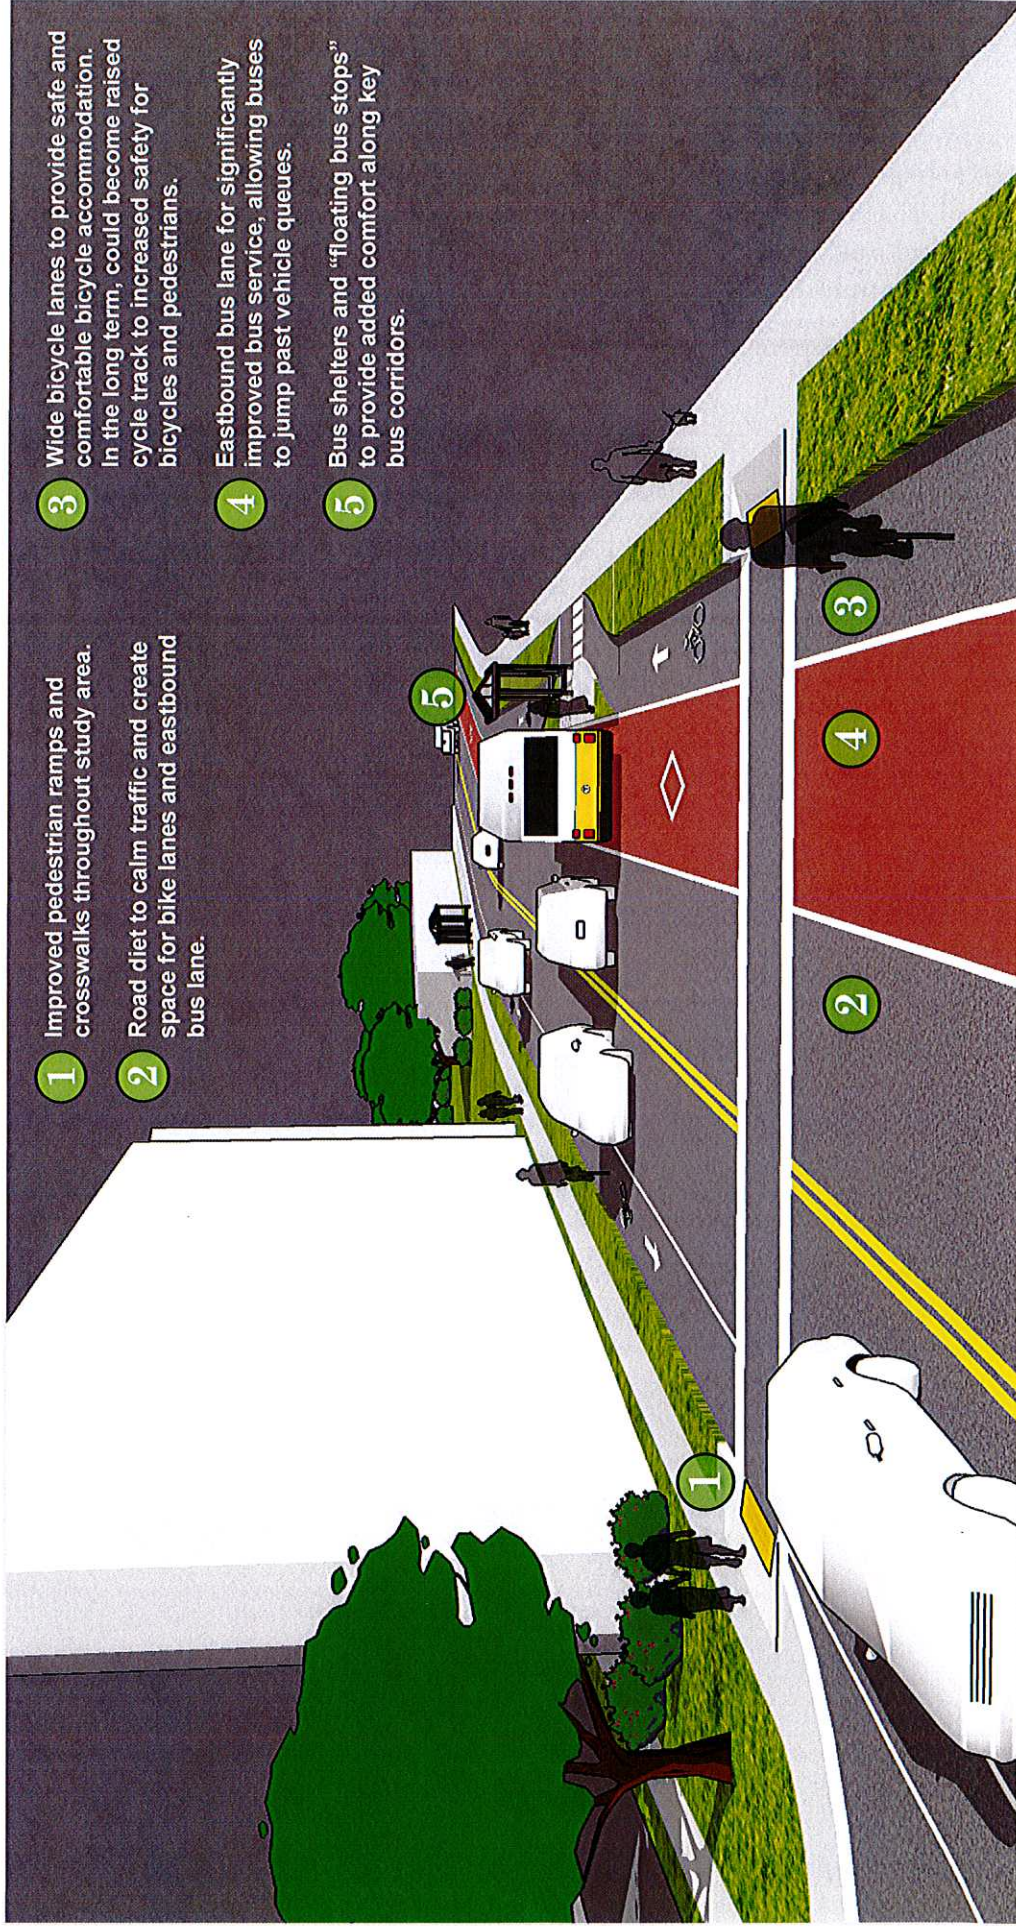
Road Diet, Alternative 2: Mount Auburn Street at Brattle Street Looking East
